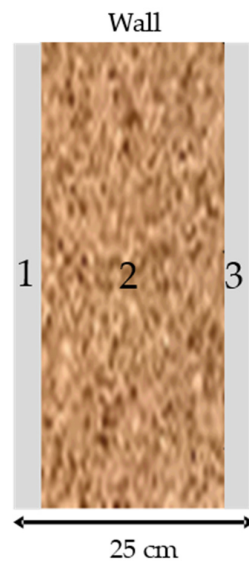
Wall components: (1) cement plaster exterior; (2) concrete hemp (HLC2), cement block or compressed earth brick, and (3) cement or lime plaster interior.
